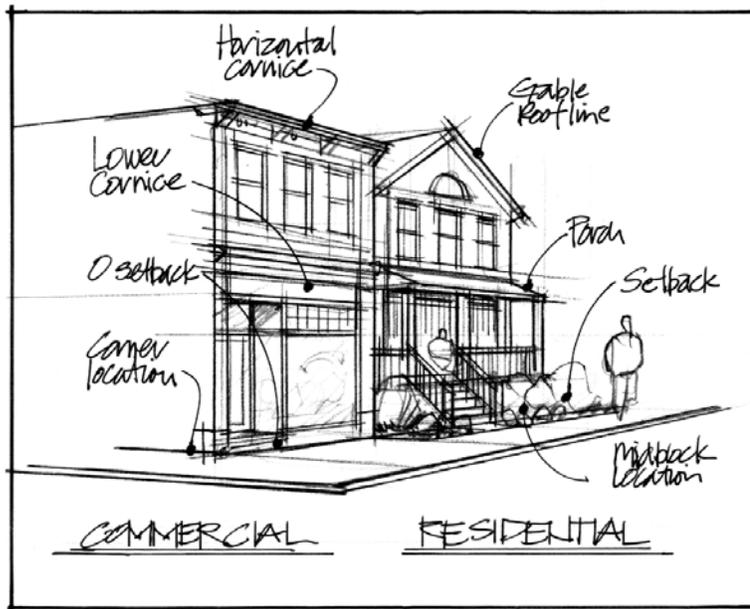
(b): Example of Building Façade Continuity
